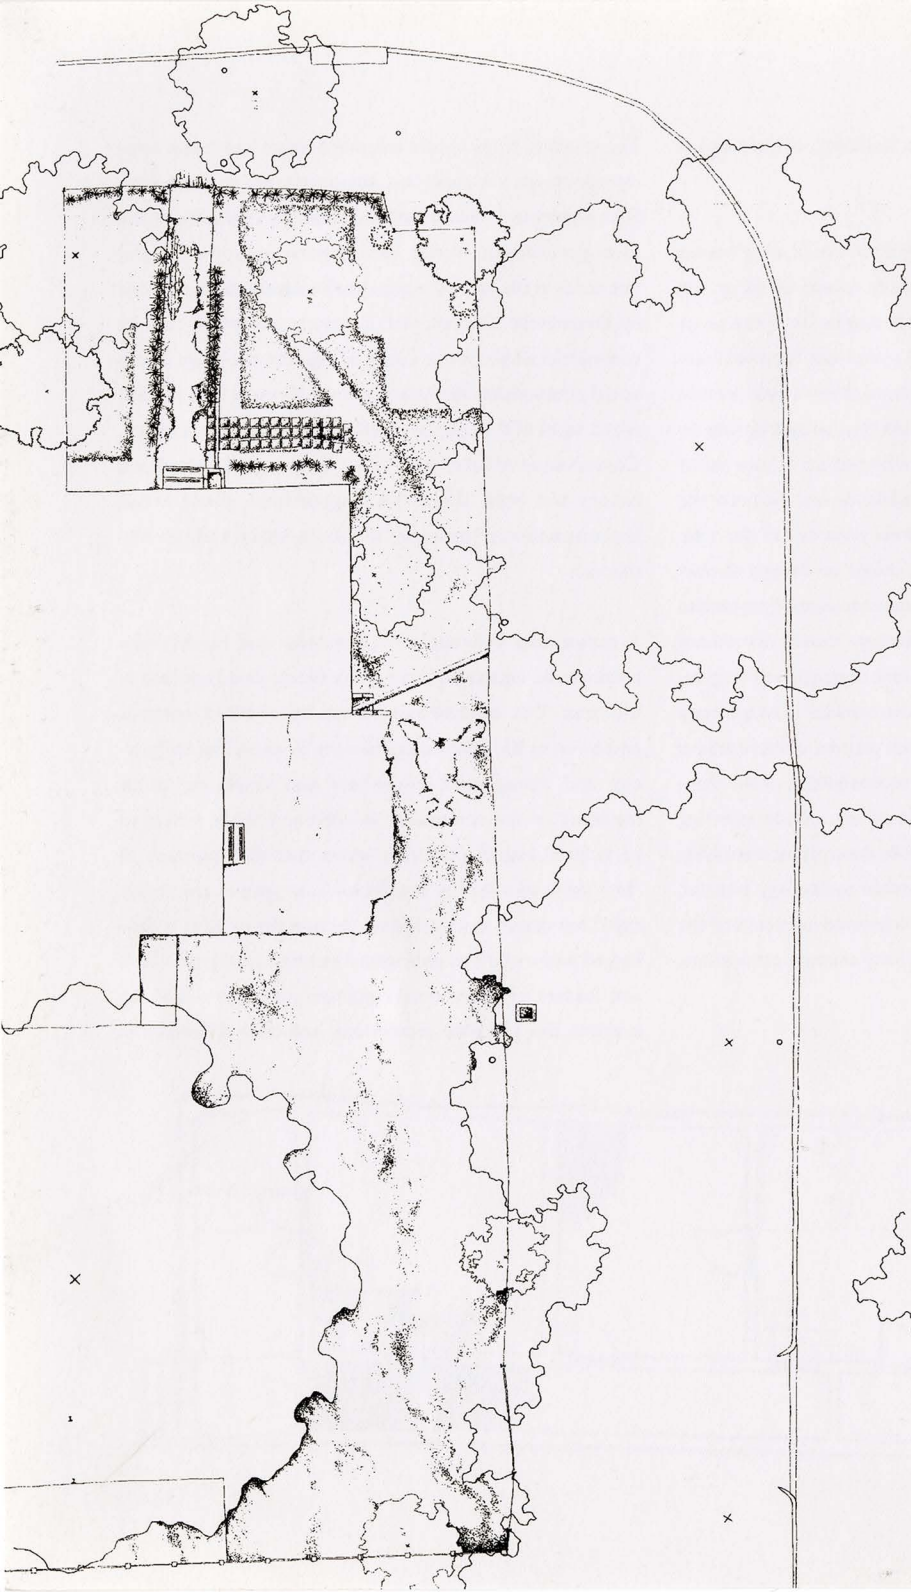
(far right): Ground plan of house 156 (Kim, Huang, Dzirba & Sloane 2003)
